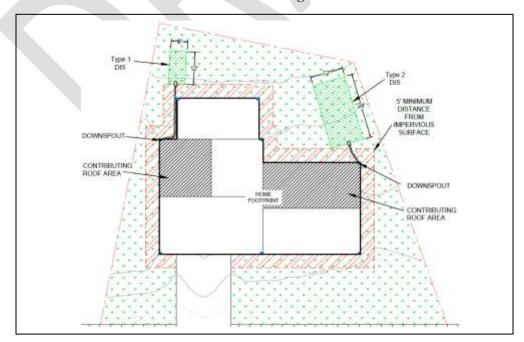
Schematic Plan View of a Disconnected Roof (Anderson, NCSU-BAE)
